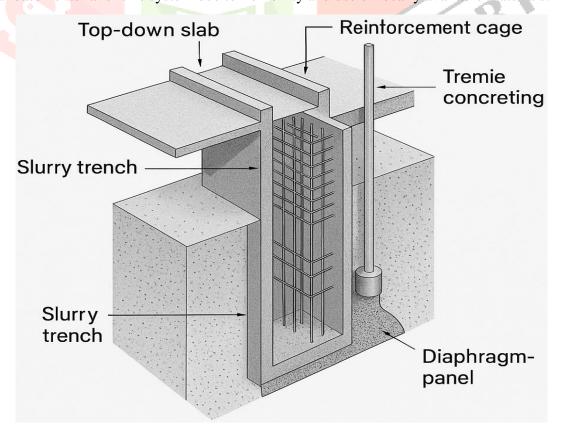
3D schematic of a Diaphragm Wall showing trench excavation, slurry support, reinforcement cage, and tremie concreting (as per IS 9556:1980)
